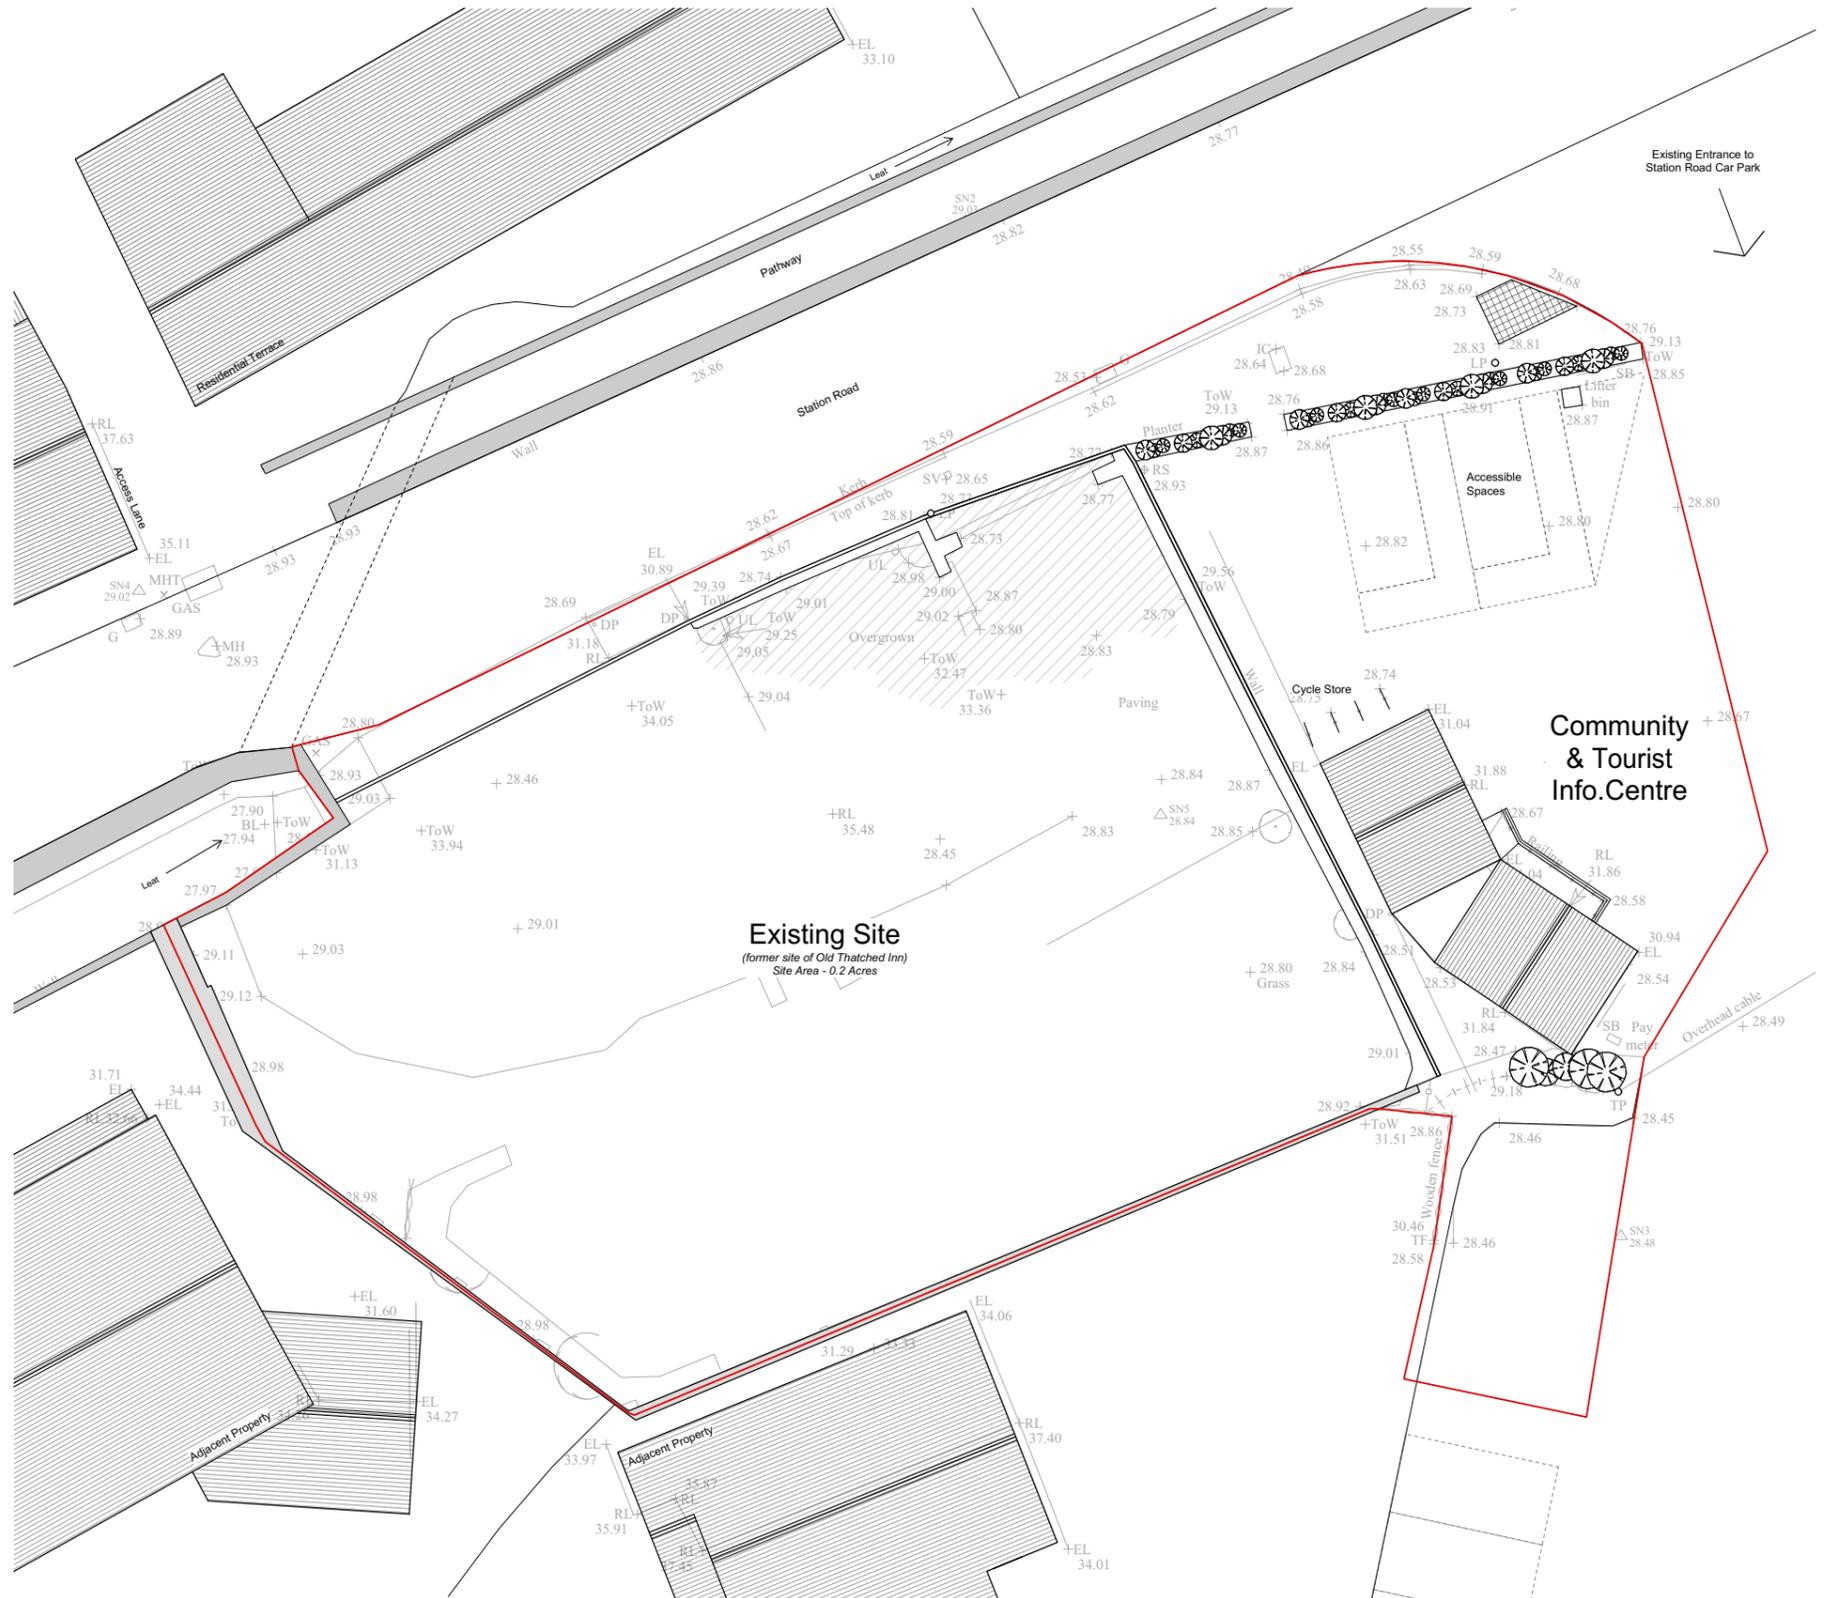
Existing site Plan taken from drawing - 1690_S_02 - not to scale
